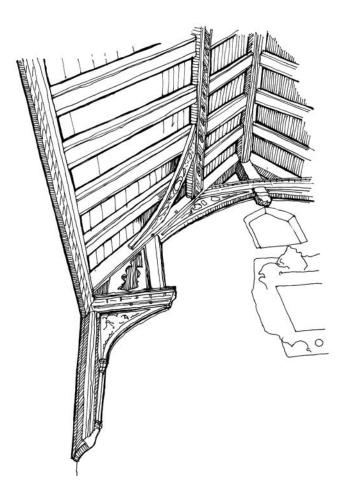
Illustration of the hammerbeam roof of the Audley Chapel, St Michael's Church, Berechurch Hall Road (corpus no. 2) (not to scale)
